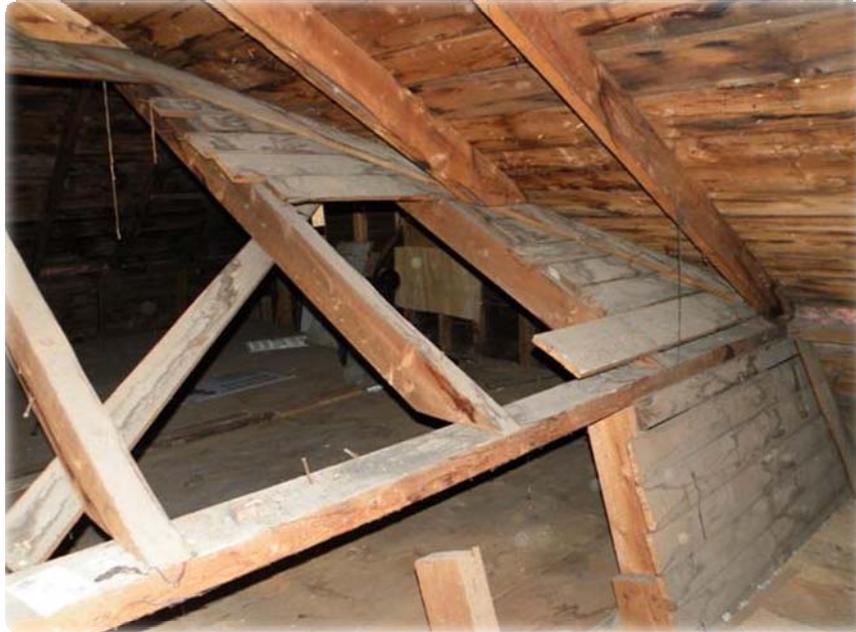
Interior view of the second and third roofs arching over the remnant gable of the original roof (note the original covered attic window in the centre of the image beyond the frame of the second roof).
